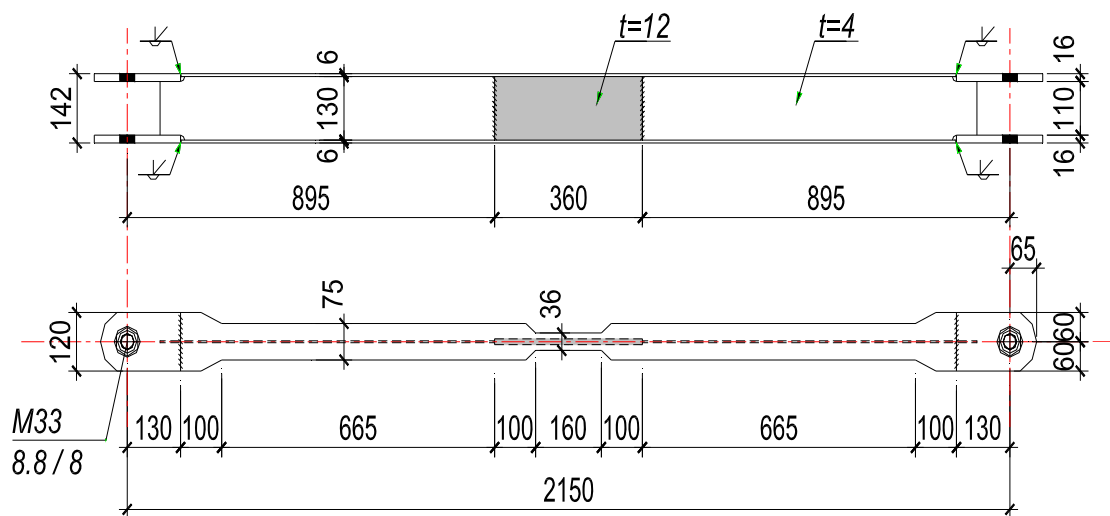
Overview of modified brace member F75.6W130.4-M160.36-T12 at the second storey
